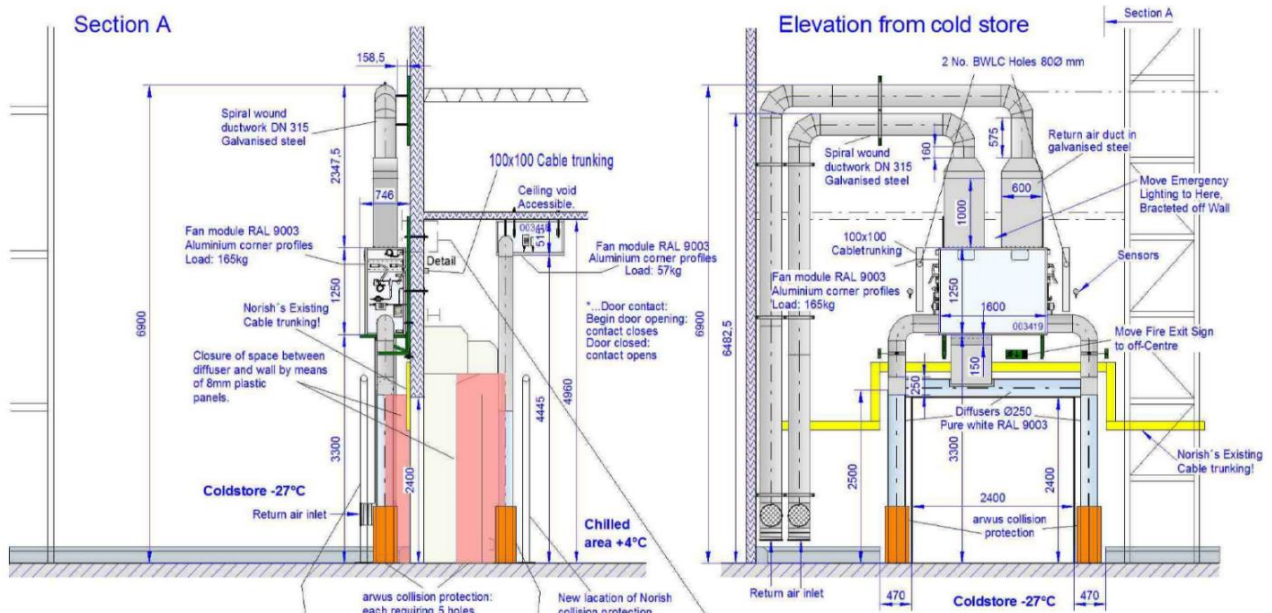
As-built drawing of the air separation inside and outside Door 1
